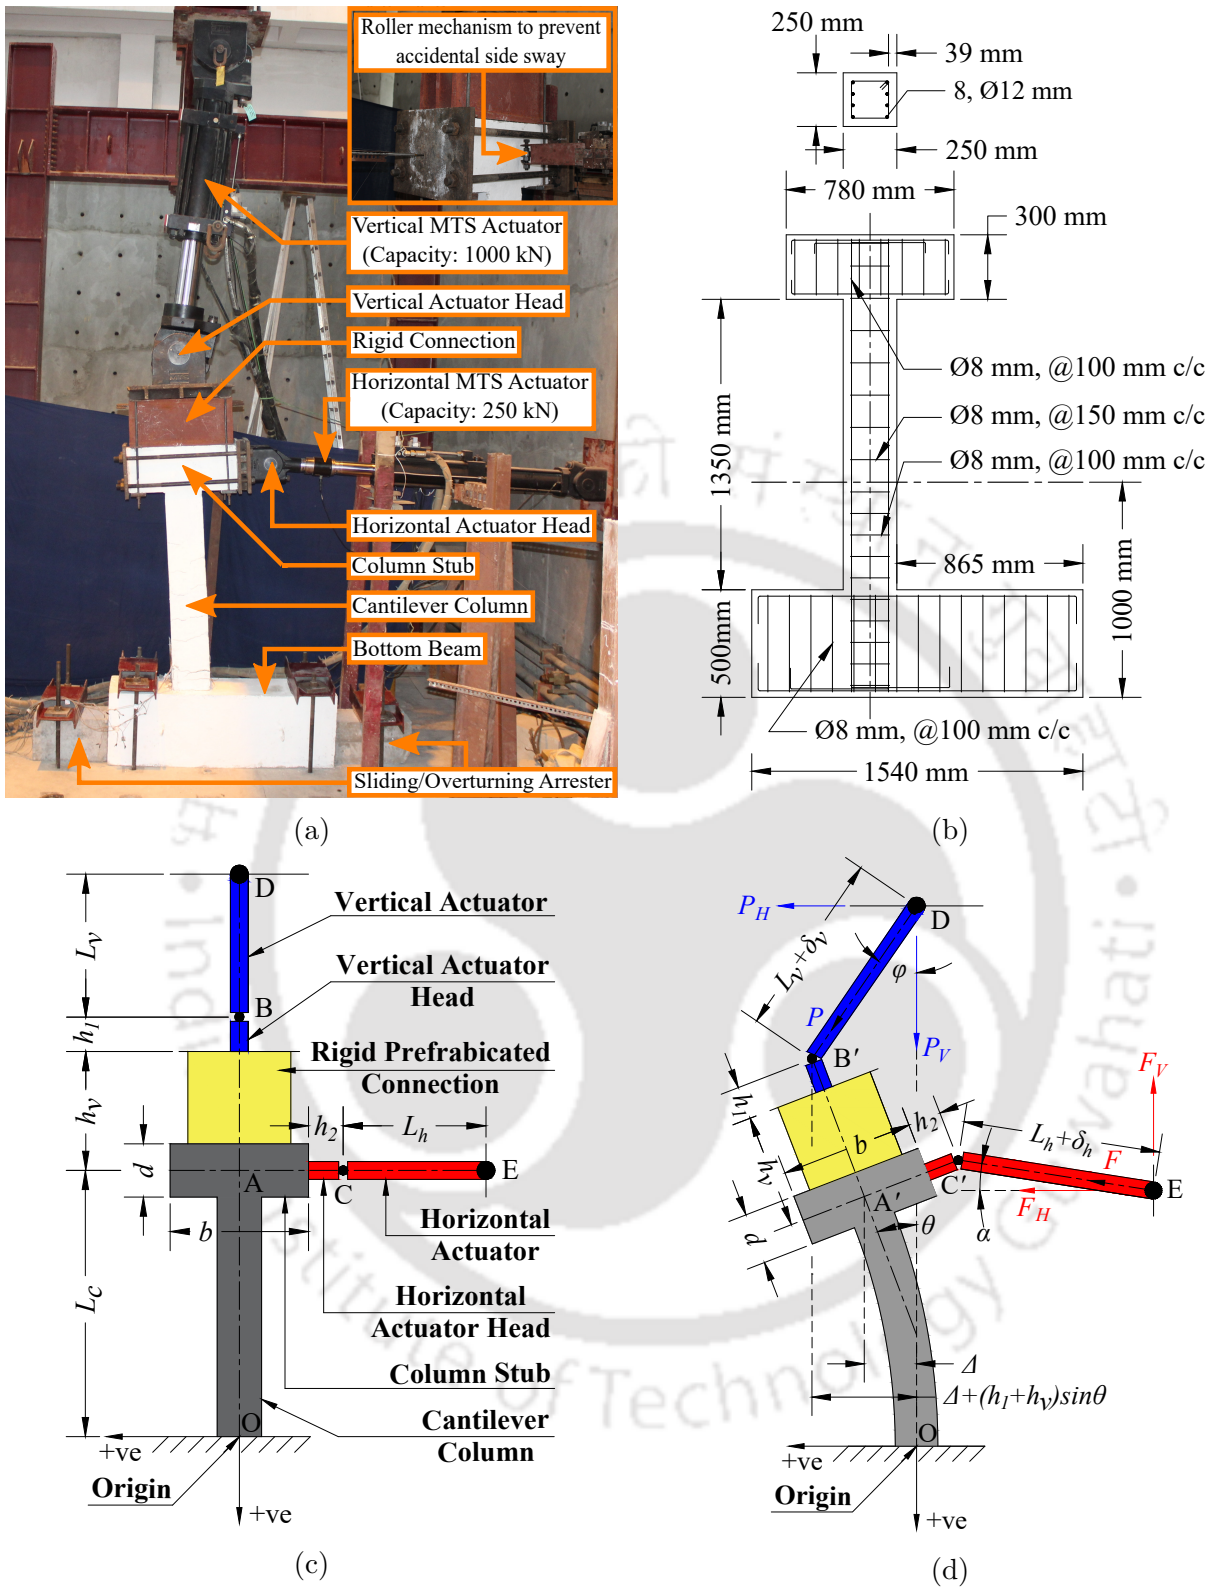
(a) Typical experimental arrangement [199], (b) reinforcement detailing of a specimen [199], (c) schematic diagram of an undeformed specimen, (d) schematic diagram of a deformed specimen
